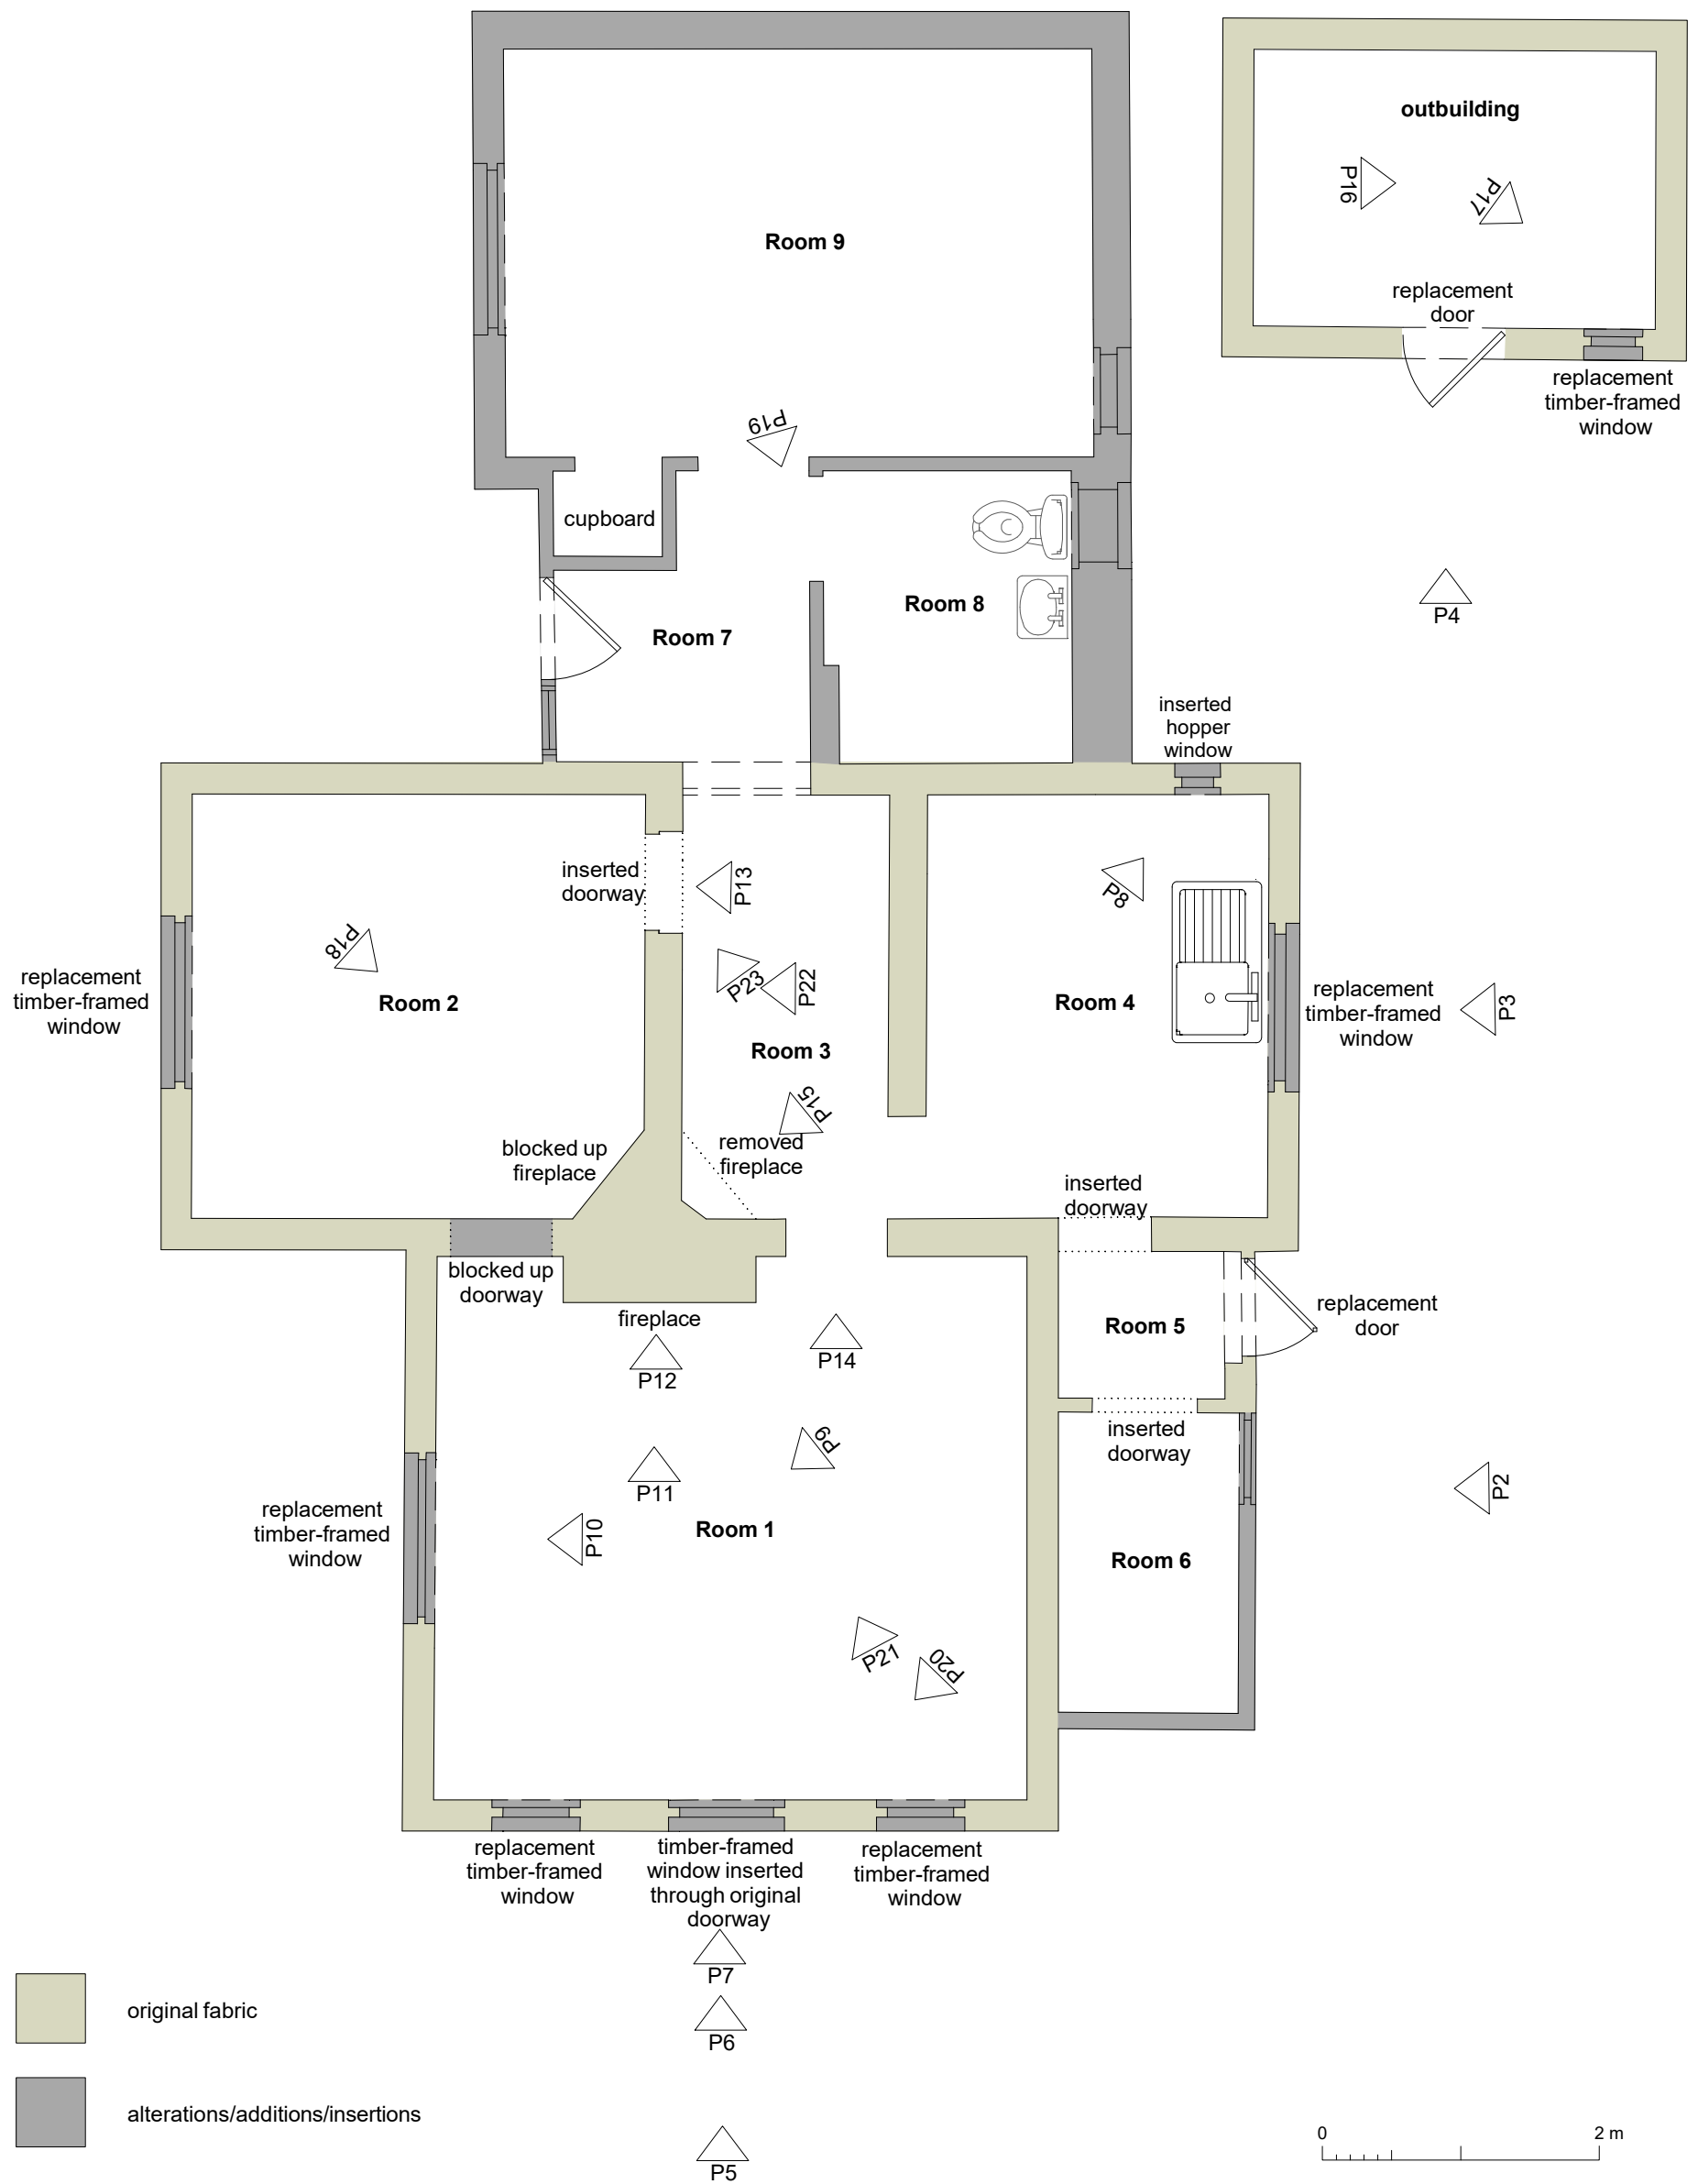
Plan of the lodge and outbuilding. The numbered arrows indicate the location and orientation of photographs included in this report.
